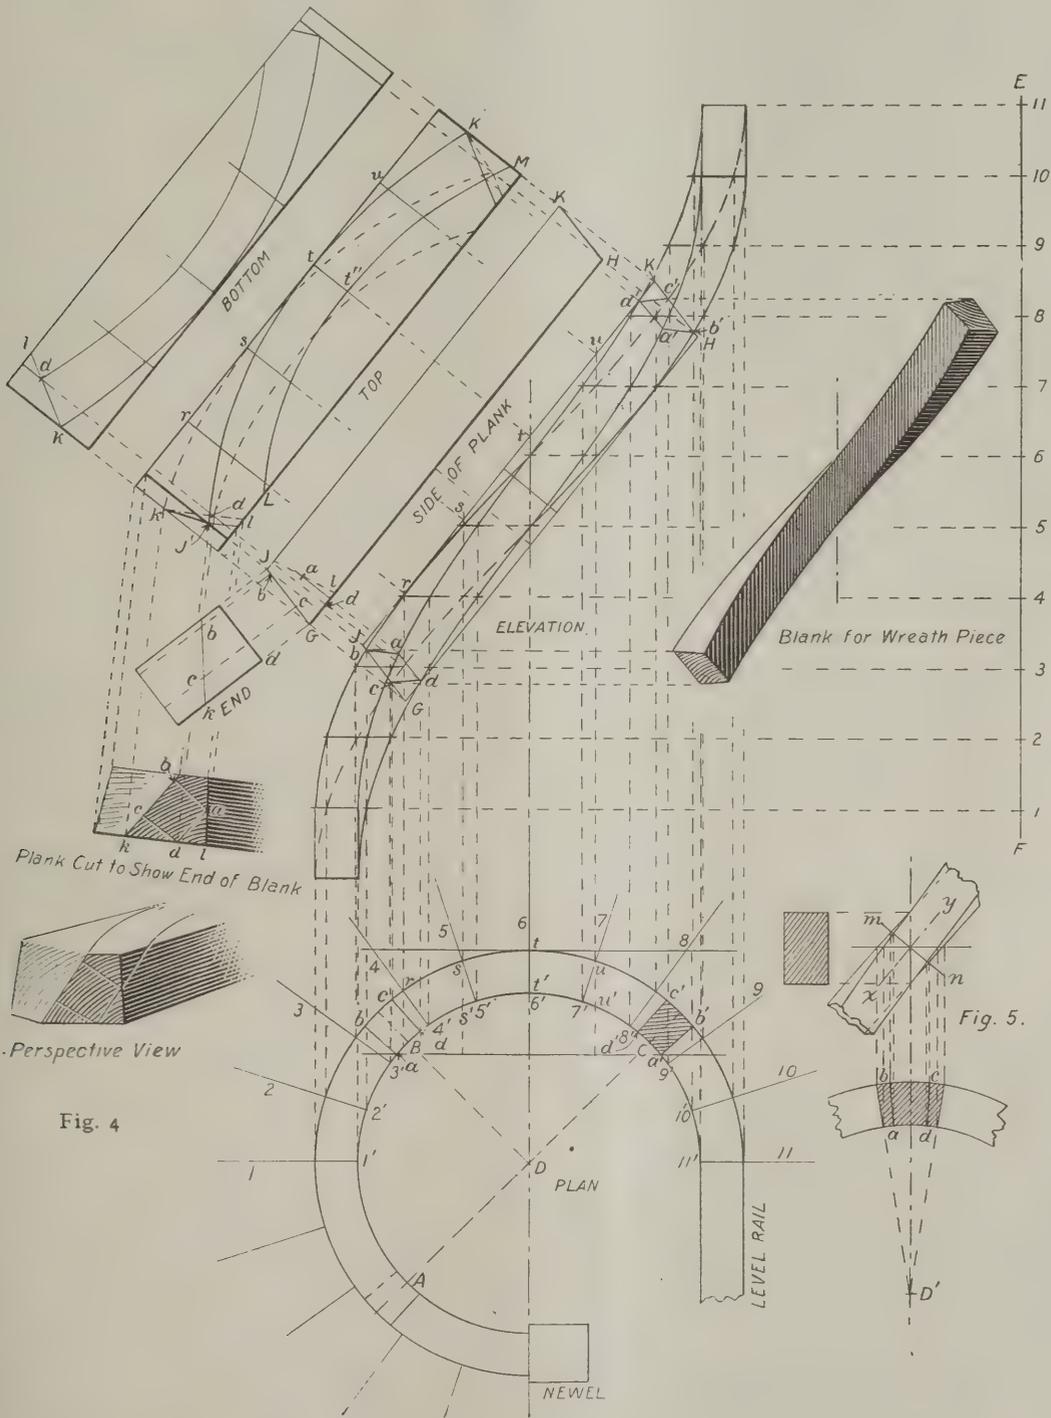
Plan and Elevation of Stair Rail, Showing Blank for One Section in Several Positions
